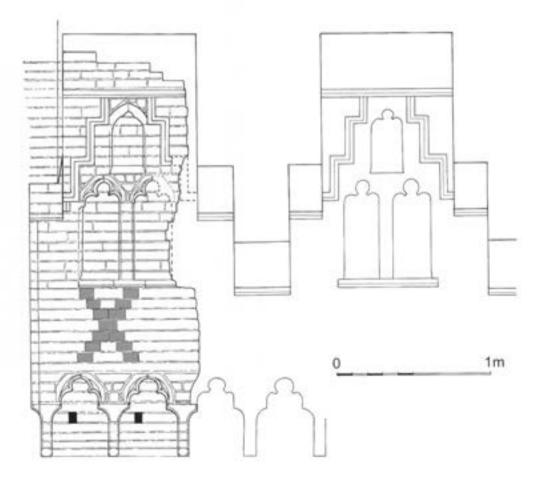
Crenellated parapet at the top of the north side of the stair tower.
